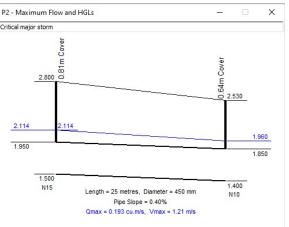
Pipe longitudinal sections and hydraulic grades (10% AEP)
